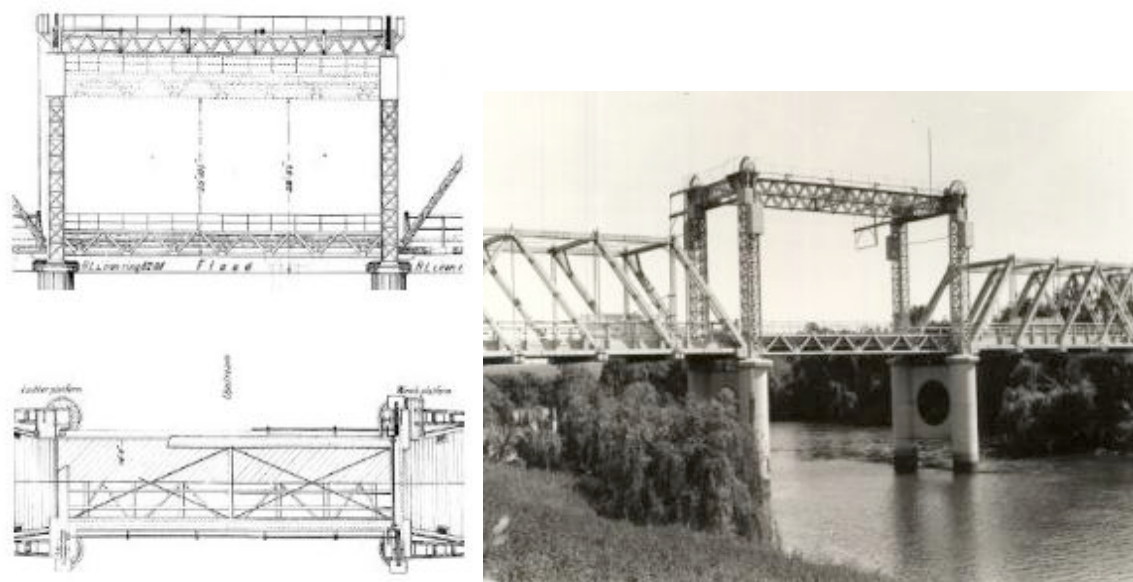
Plan, elevation and 1935 image of Dunmore Bridge (Source: RMS)
